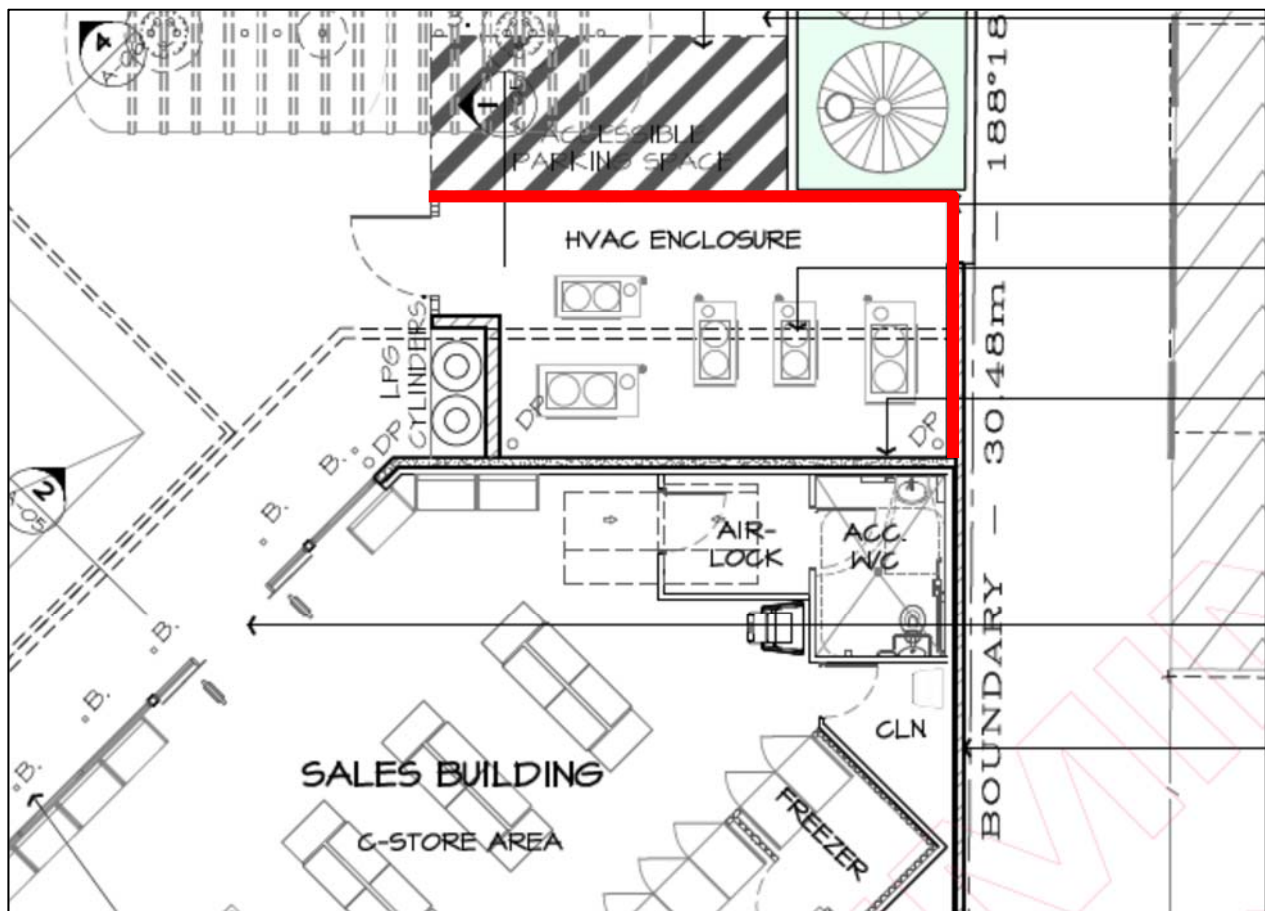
Architectural drawing outlining the extent of the noise barrier/wall and plant locations
